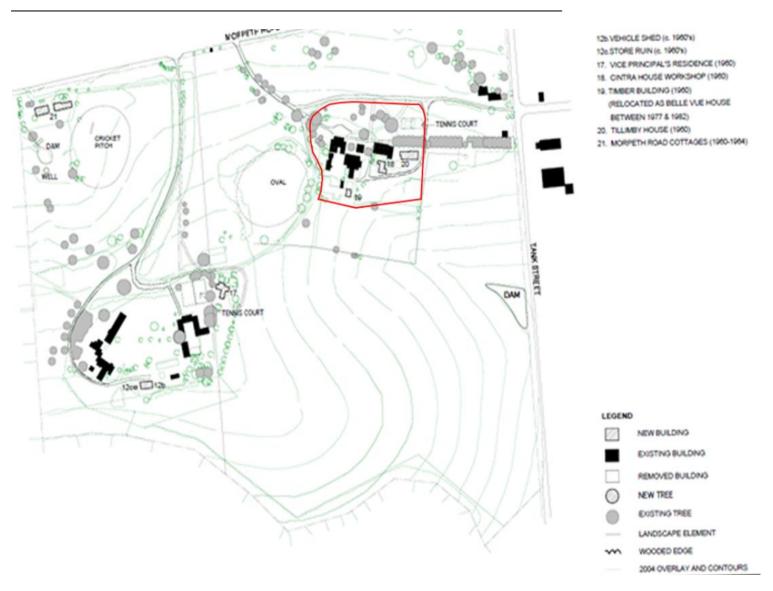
CMP Survey: Key structures plan for 1960 showing study site outlined in red.
